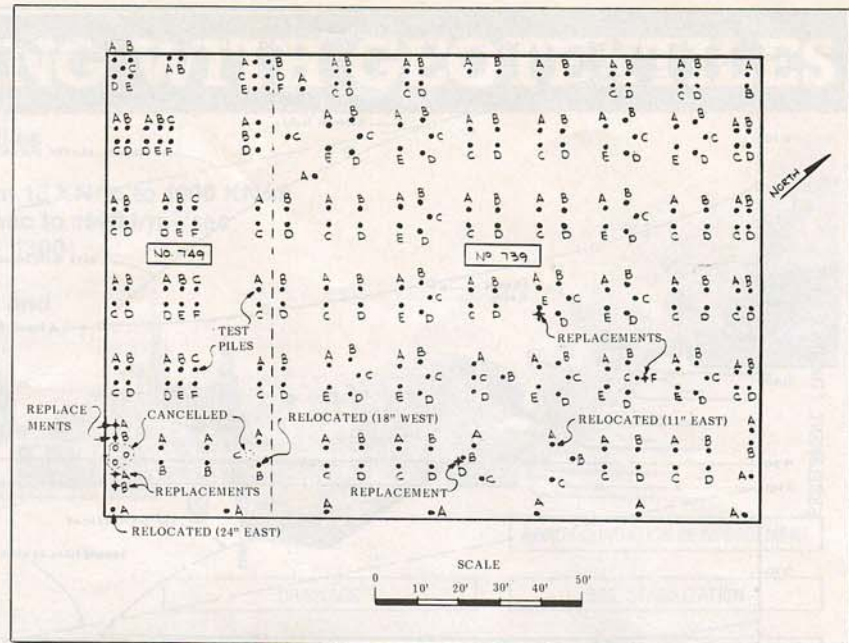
Plan of minipile arrangement, Boylston St., Boston, MA.
